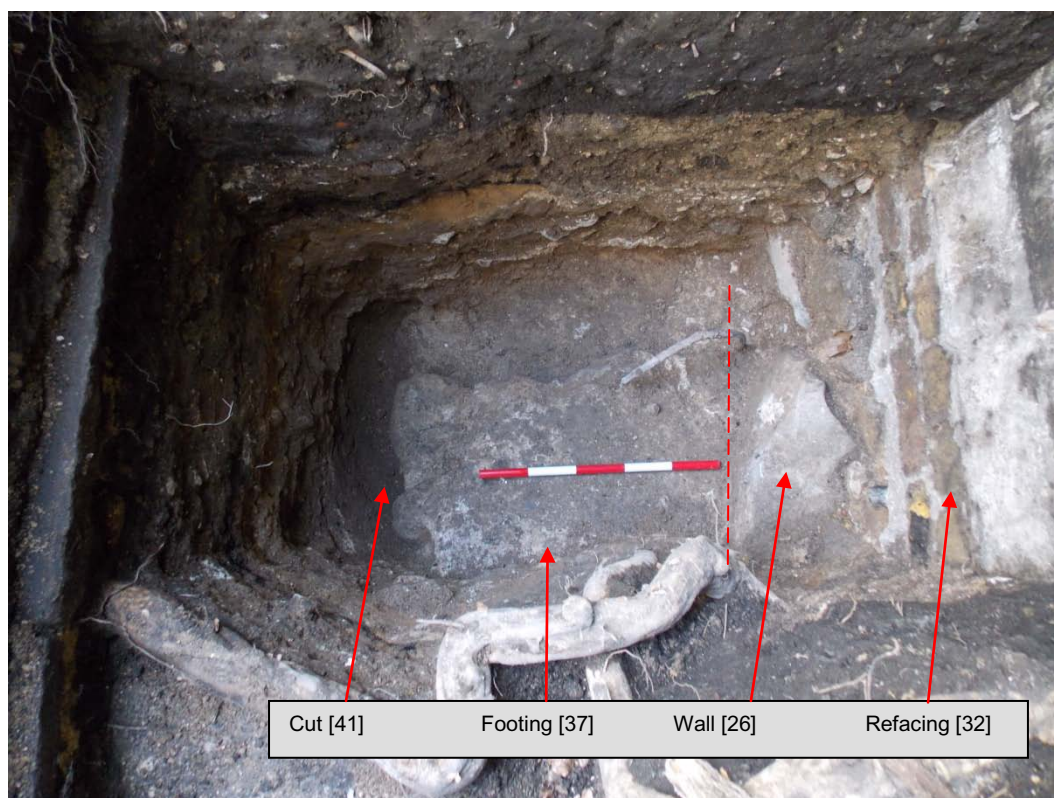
Test Pit 2 viewed east showing footing [37] at base (scale = 0.5m)
